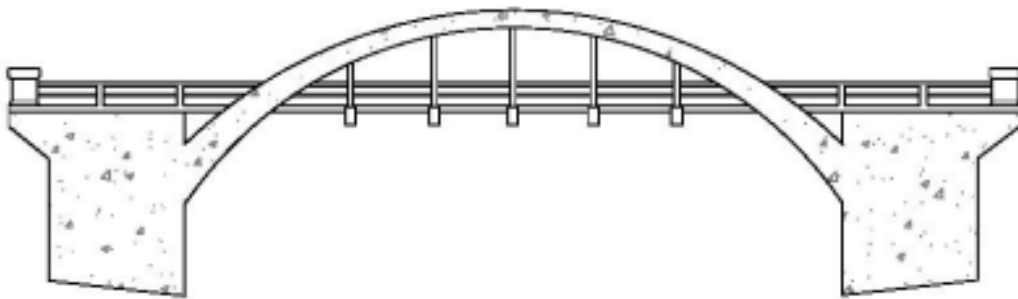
RAINBOW ARCH BRIDGE (DRAWING PROVIDED BY MKE ASSOCIATES LLC, 2013).
